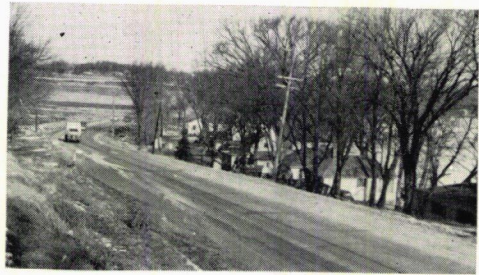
Location 5(b): Looking north on US 51 about 11 1/2 miles southeast of Madison.
